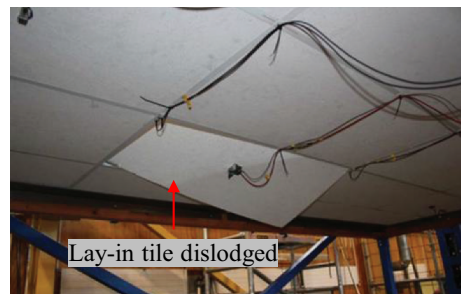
Lay-in tile dislodgement under sinusoidal test observed on a fully-floating ceiling (Pourali et al. 2017).
